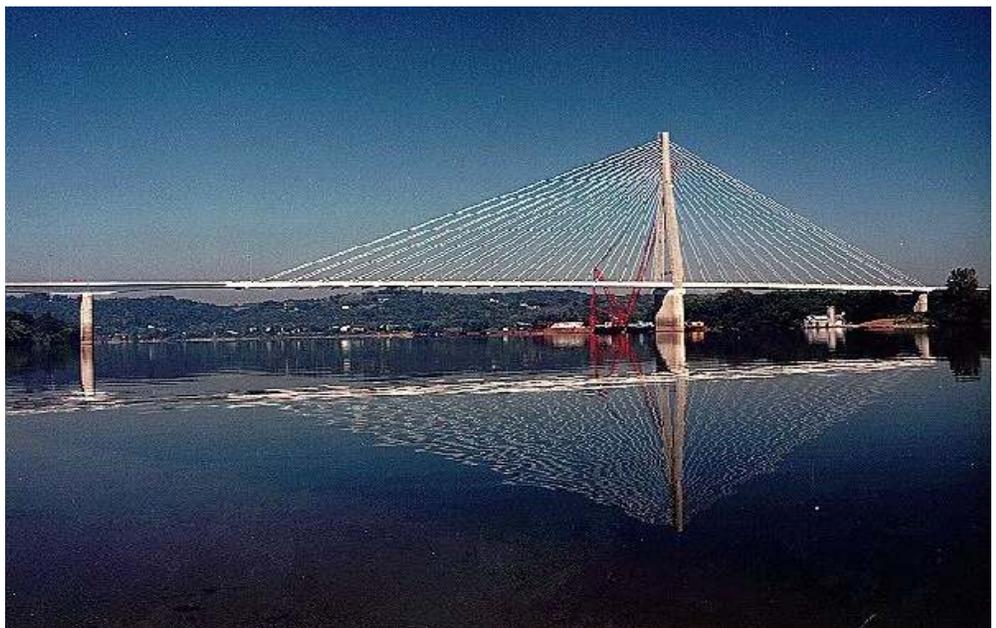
The Ohio River reflects east elevation of hybrid , main span girder; pier 2 cantilever (L), cable-stayed (R).
